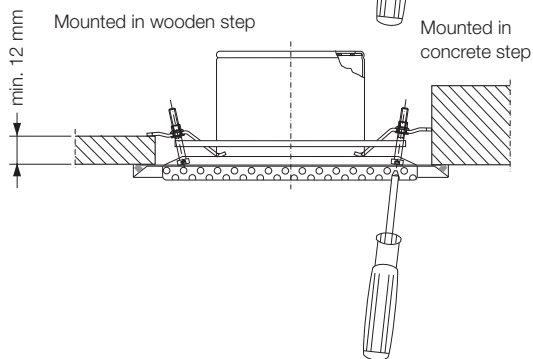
Mounting sketch for circular step displacement outlet, showing DN 80 (Similar mounting for DN 100)
